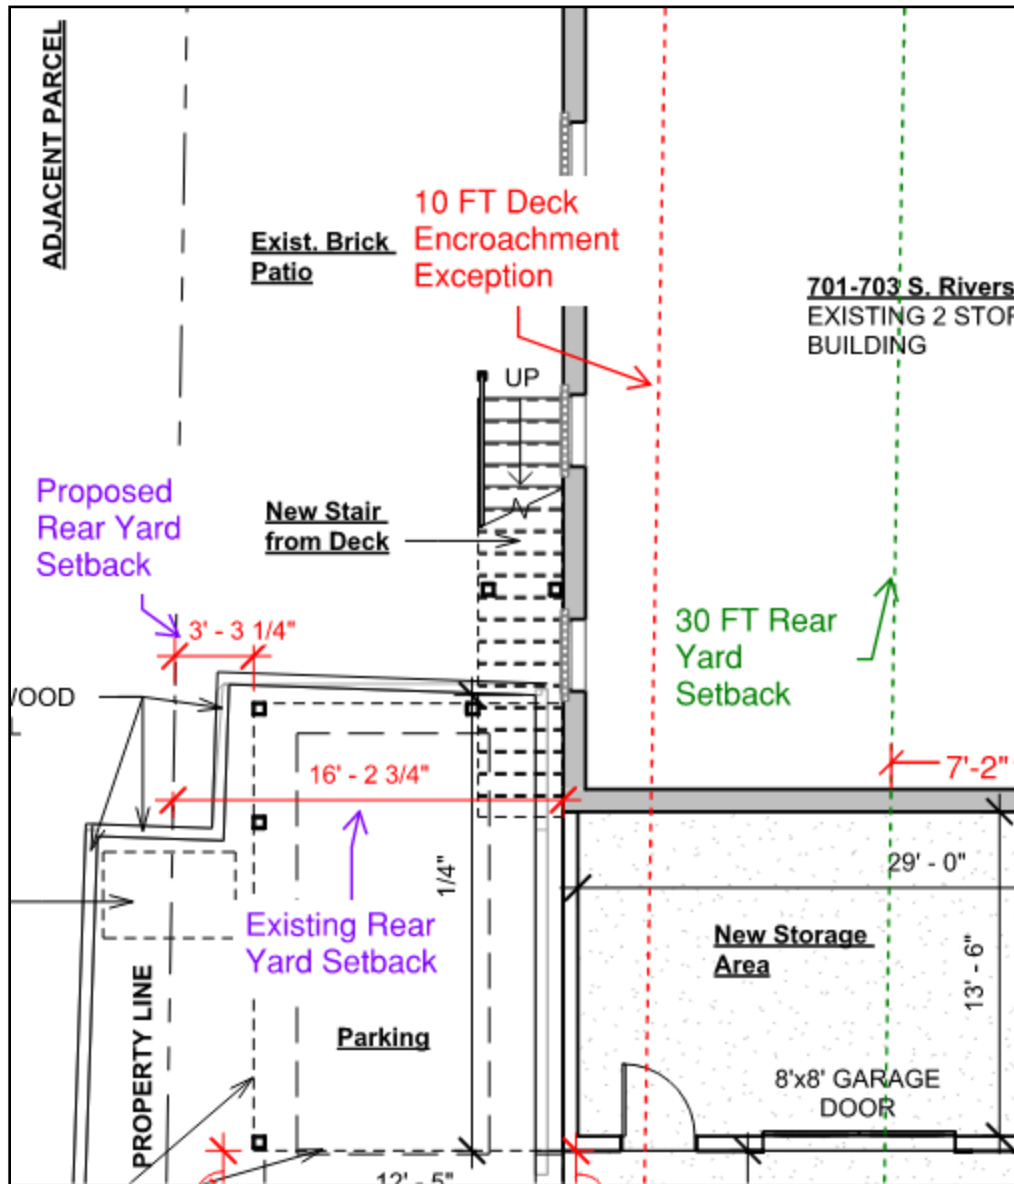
Submitted Site Plan screenshot with the proposed improvements, existing rear yard setback (16.25 feet), the deck encroachment setback (20 feet) and the required rear yard setback (30 feet).
